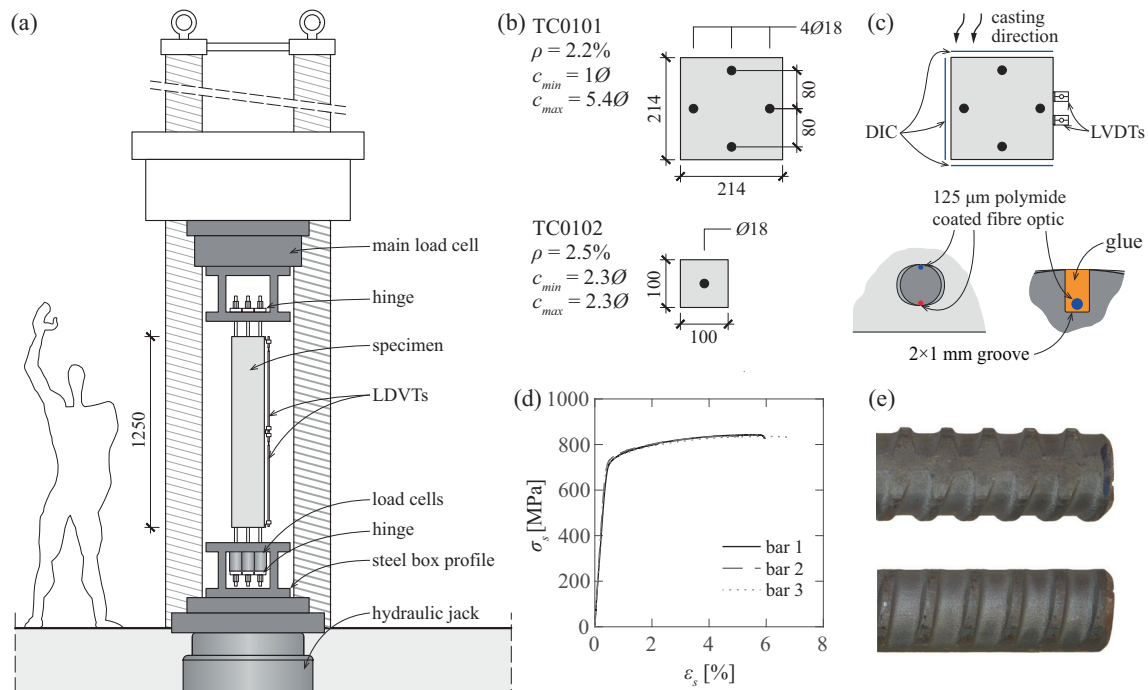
Test series TC10: (a) elevation of the test set-up; (b) specimen cross section; (c) measurement systems on the concrete surface and fiber installation for strain measurement; (d) reinforcement bar tensile tests results; and (e) rib profile.
